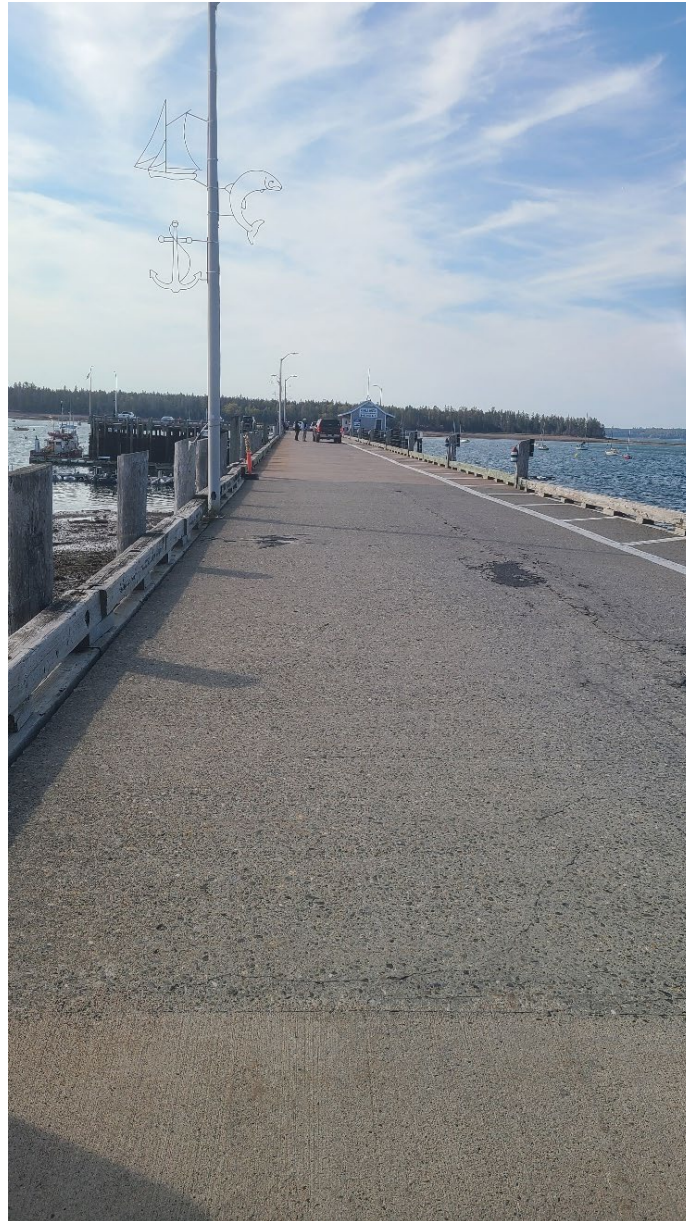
Inner Approach Deck with Repaired Section in Foreground with Centerline Cracks and Repairs.
